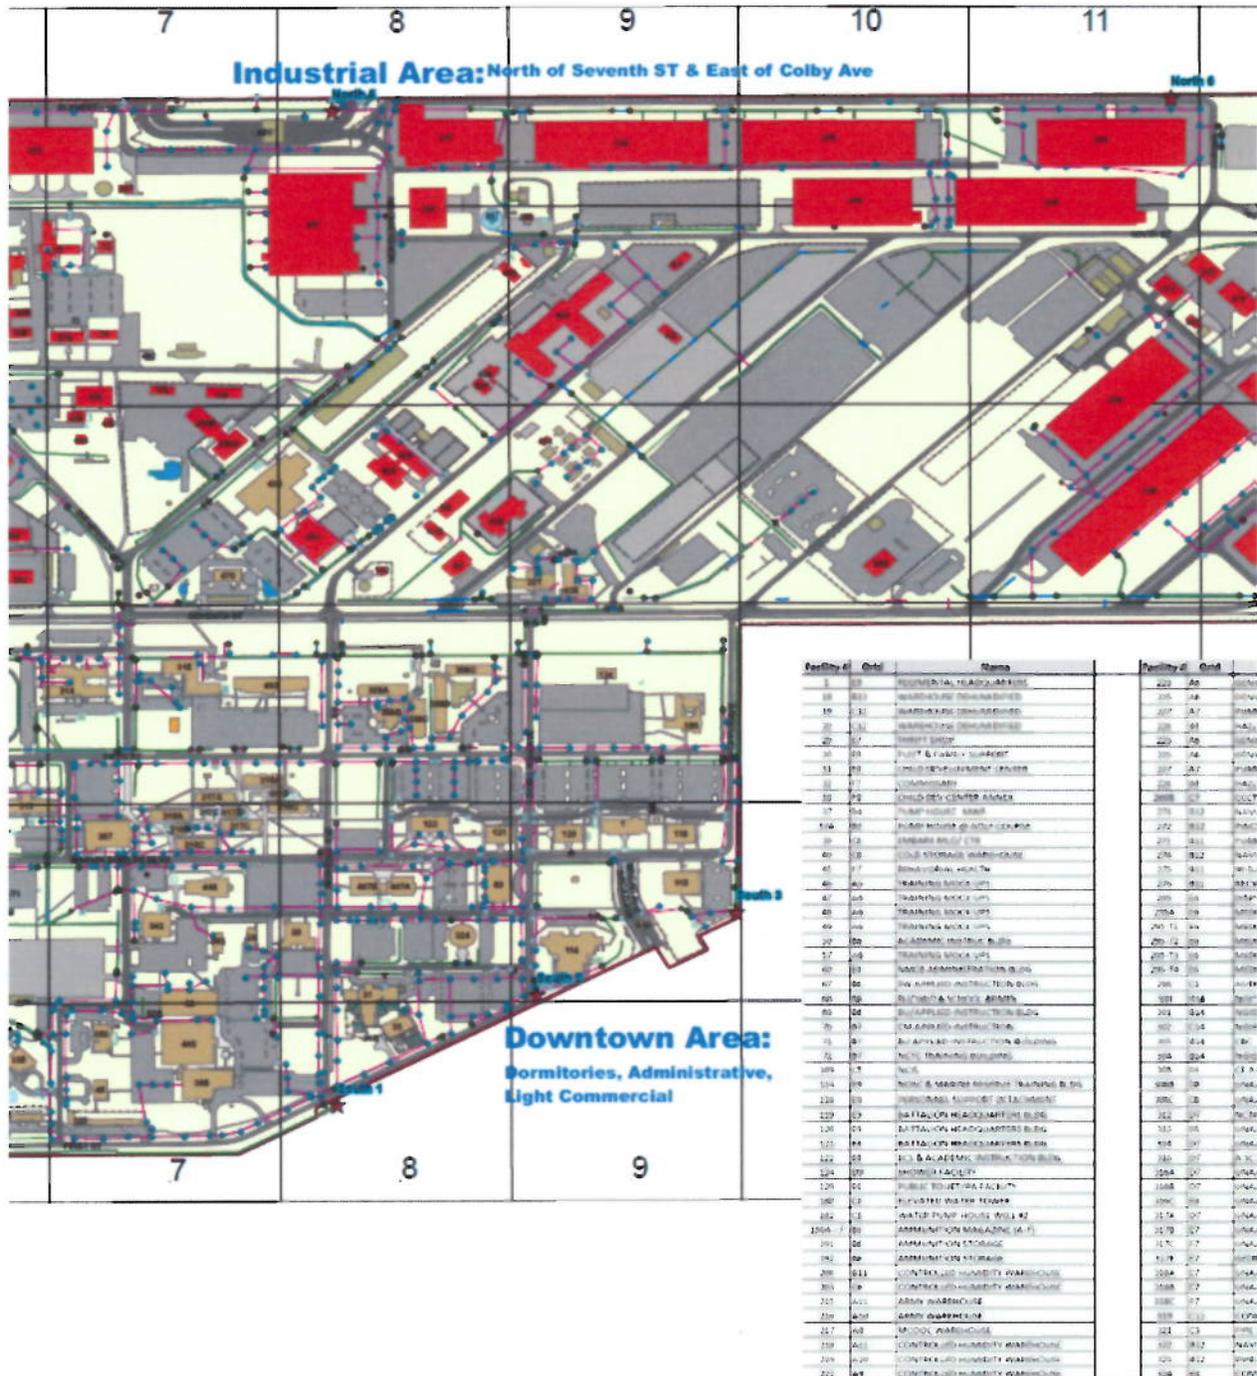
NCBC Gulfport Center: Stormwater Outfalls and Inlet
